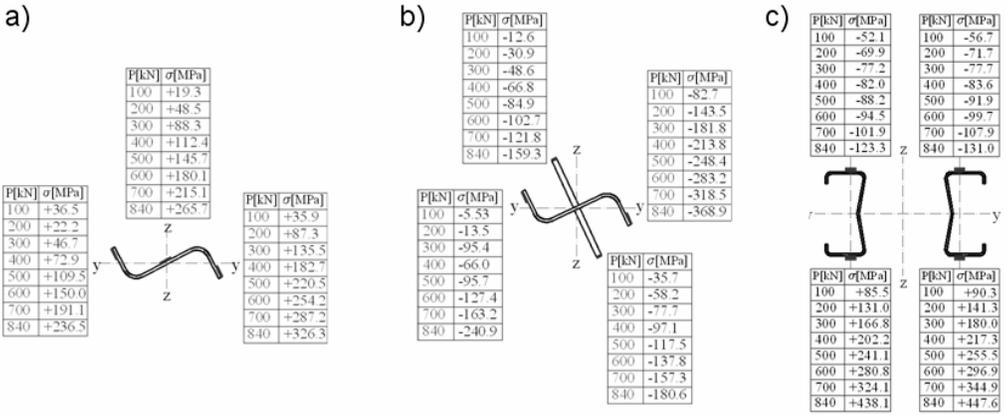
Layouts of gauges and stresses in tension bar (a), compression bar (b) and chord (c)
